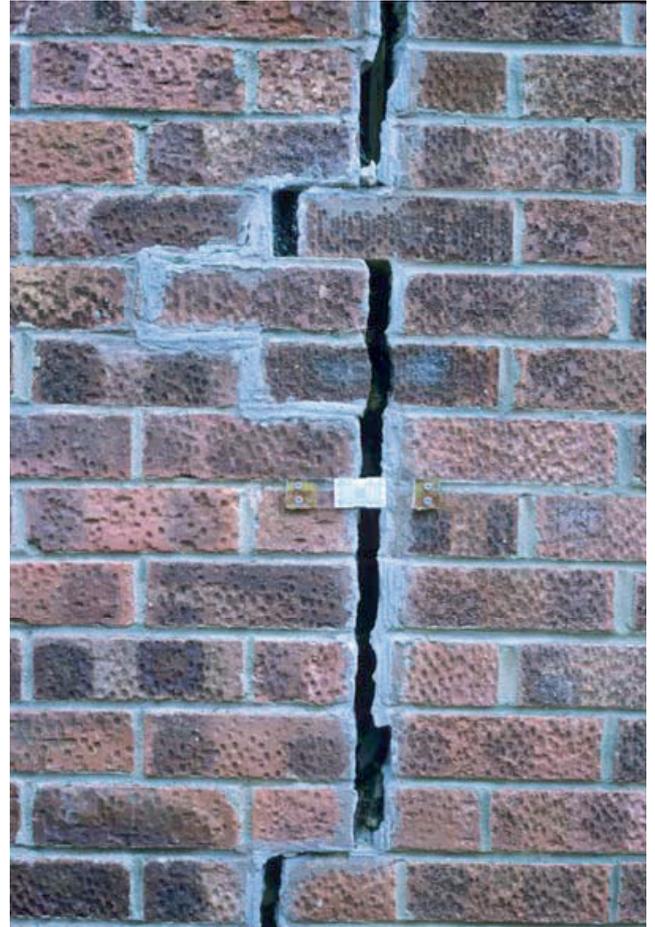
An 18 mm crack in the wall of a house at Hutton Conyers near Ripon; damage caused by subsidence at the side of a large doline formed by the dissolution of gypsum. Category 4 damage formed by loss of support and rotation of the floor slab.
